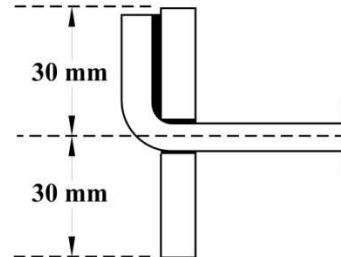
Steel plate in which the bar is welded to the rear face .
